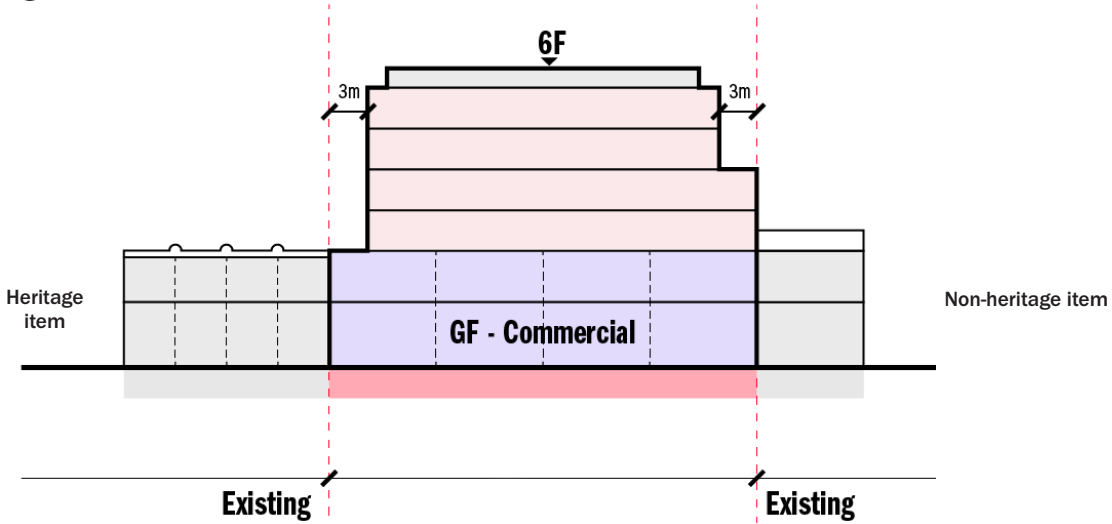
Section 1 - front elevation of a six storey mixed use development on Norton Street, showing side setbacks adjacent to heritage and non-heritage items
